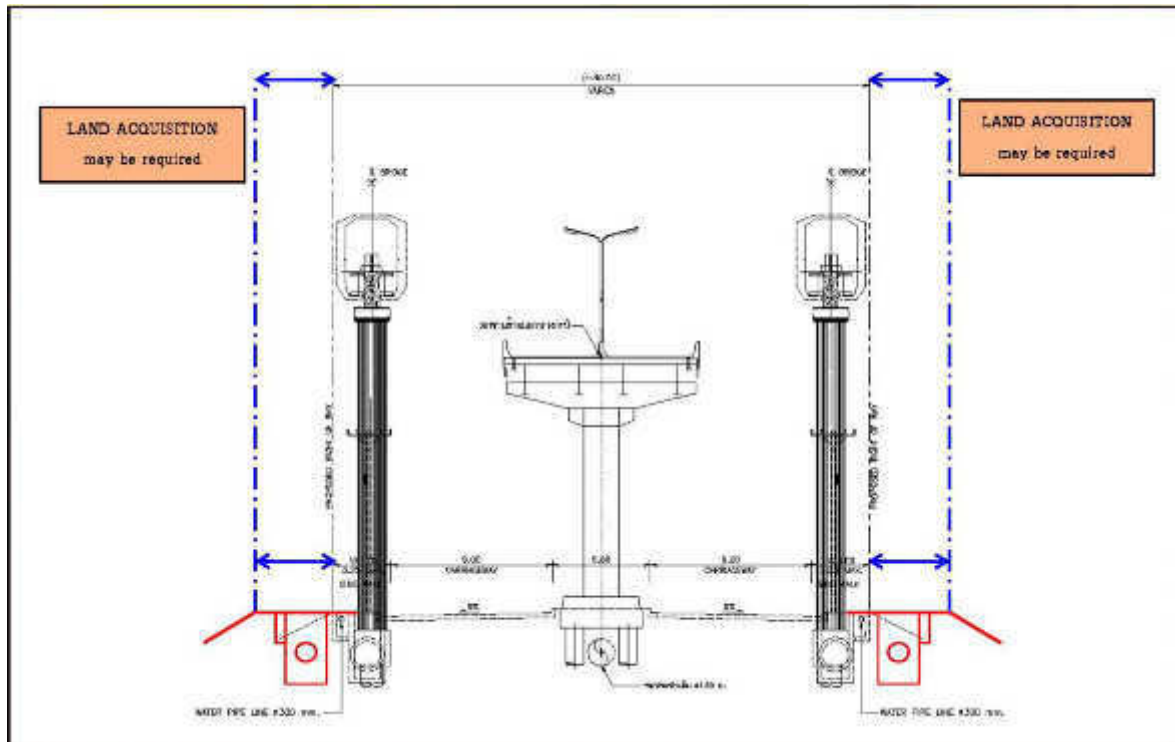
3 Cross section of project at Bang Kapi Junction, 3<sup>rd</sup> Alternative
